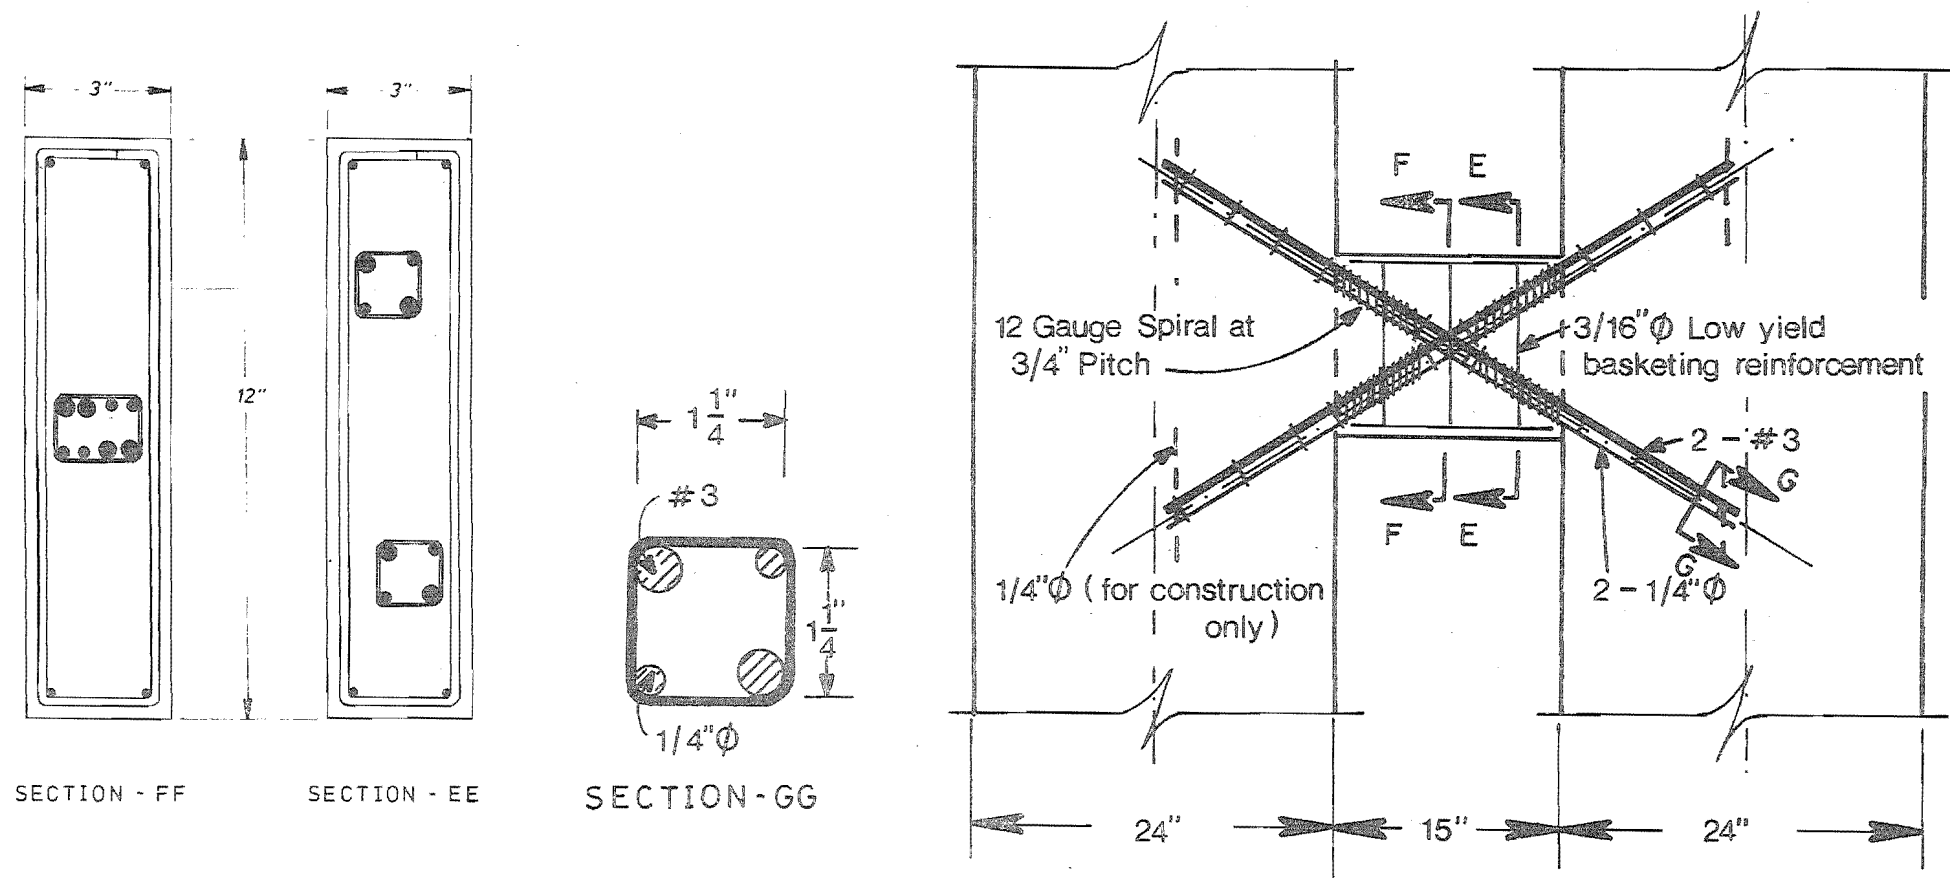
COUPLING BEAM REINFORCEMENT IN SHEAR WALL B
